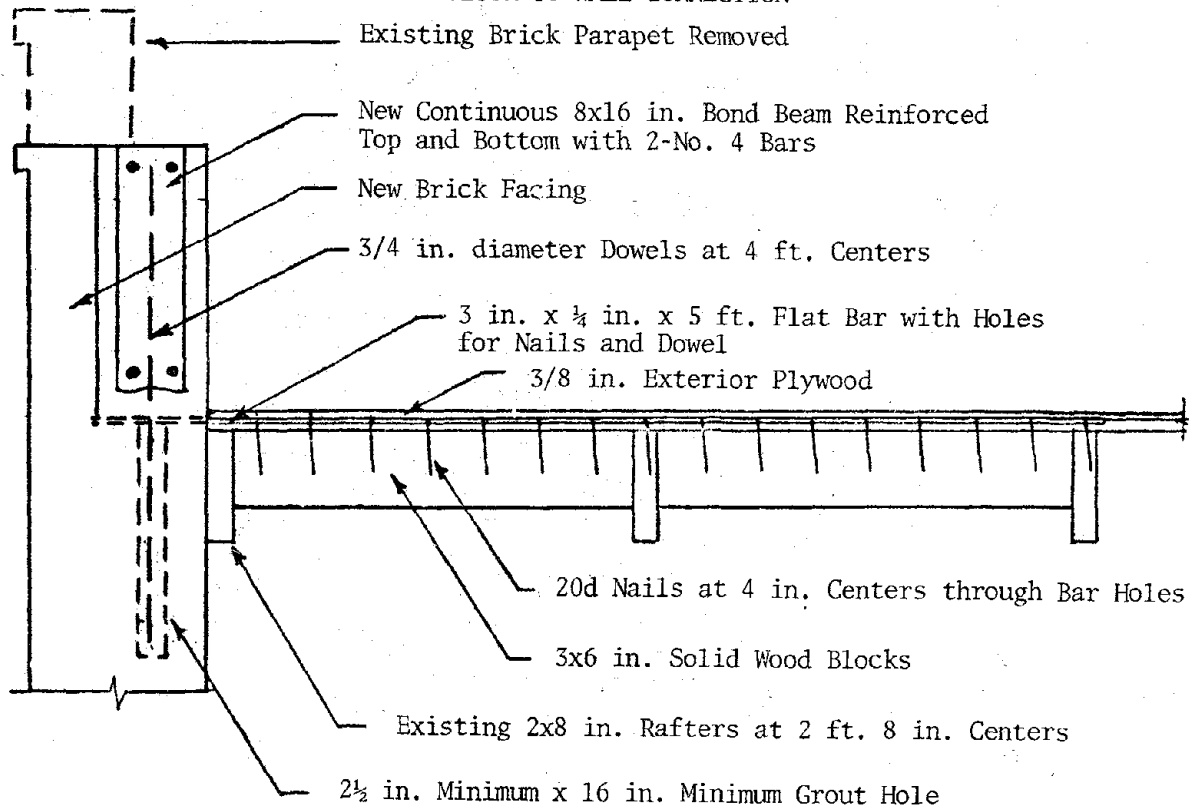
ROOF TO WALL CONNECTION AND PARAPET BOND BEAM
